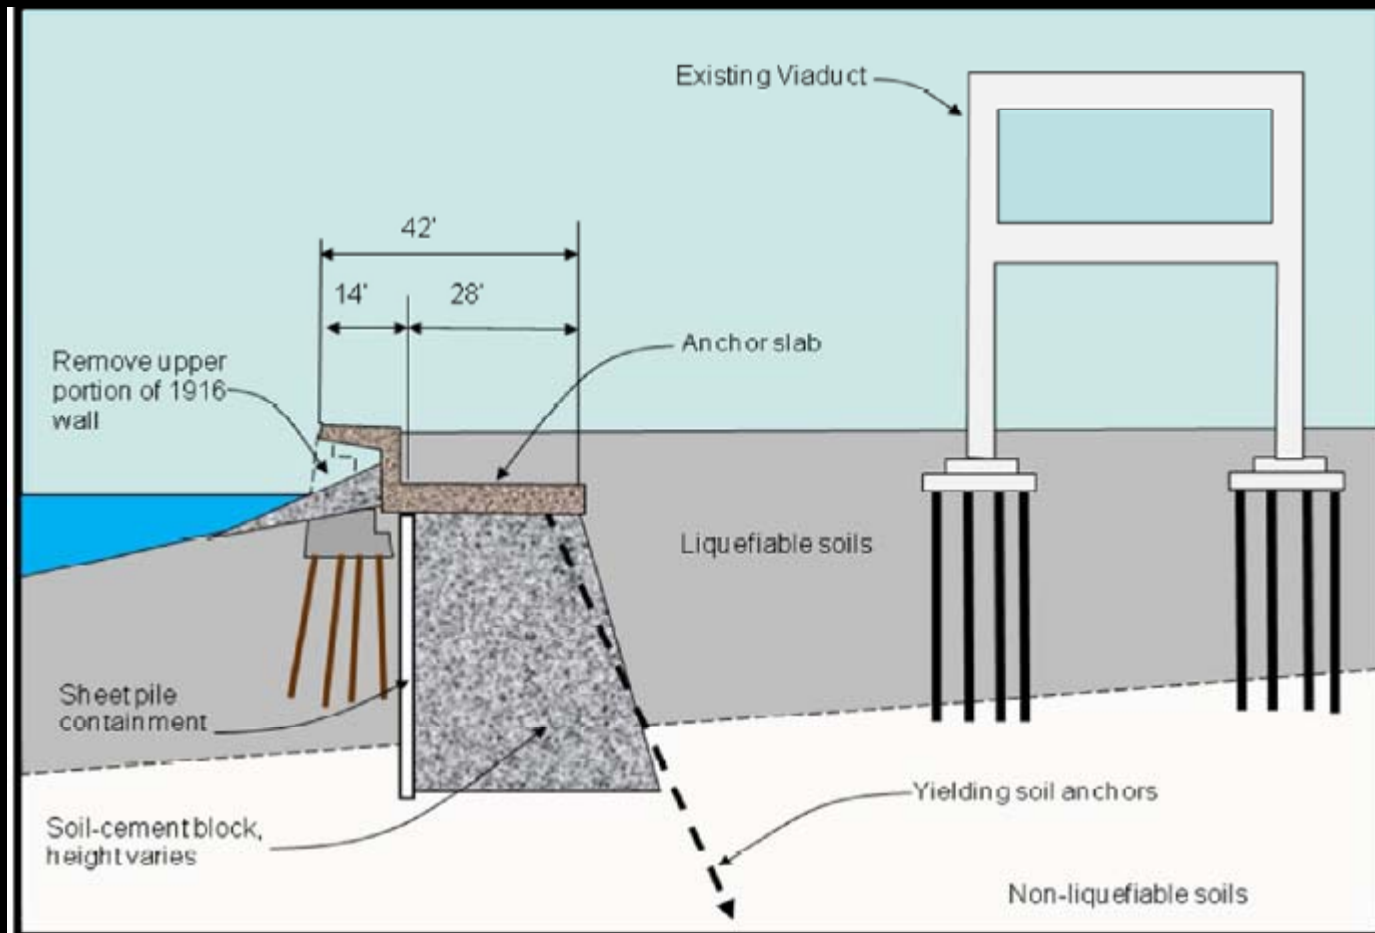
Proposed Anchored Soil Improvement Concept at the 1916 Wall
